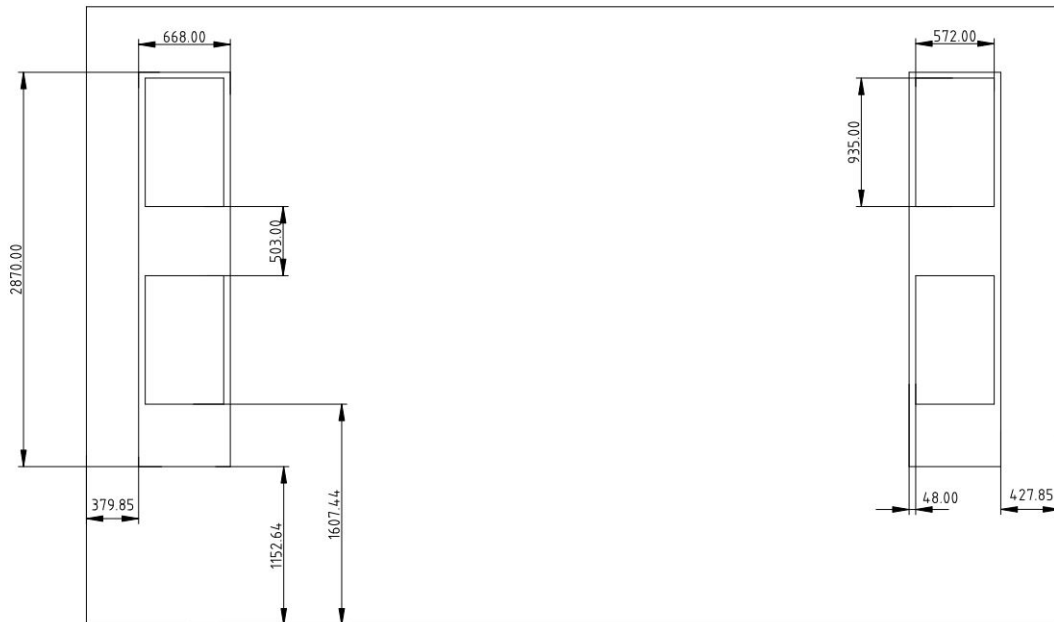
Sketch of a technical drawing representing the inlets of the air and CO duct. Dimensions in mm.
